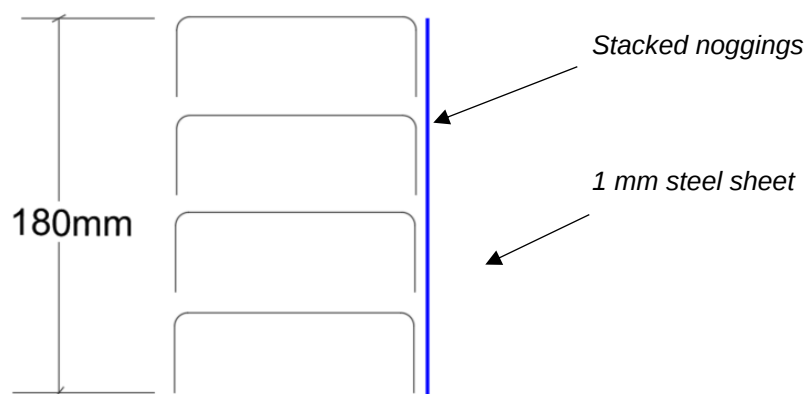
Proposed grabrail reinforcement solution for steel framing - 4 stacked noggings with 1 mm sheet
